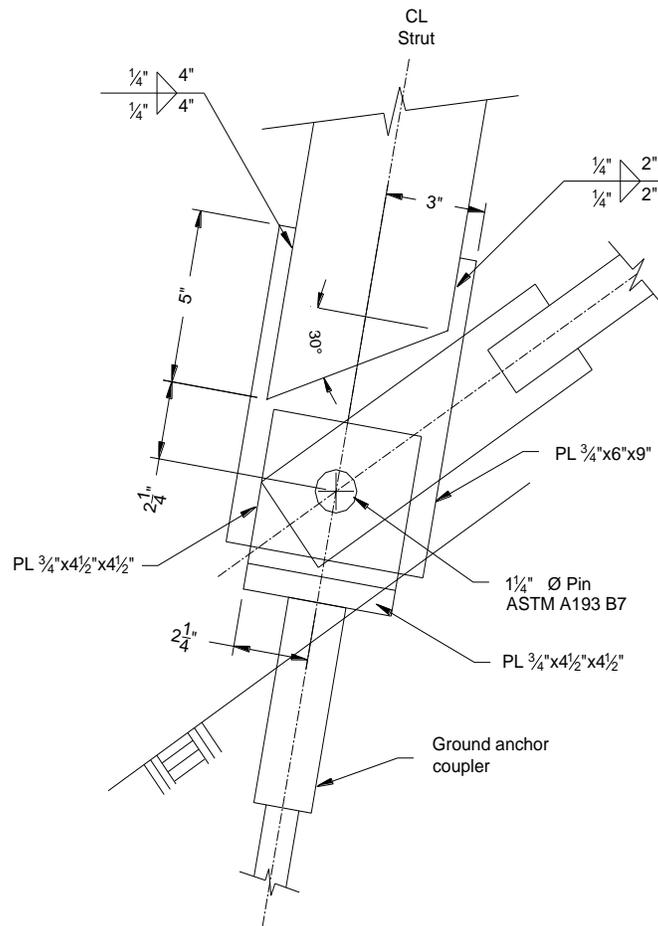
Snow supporting structure lower strut foundation and connection to ground anchor for case of ground anchor foundations.
